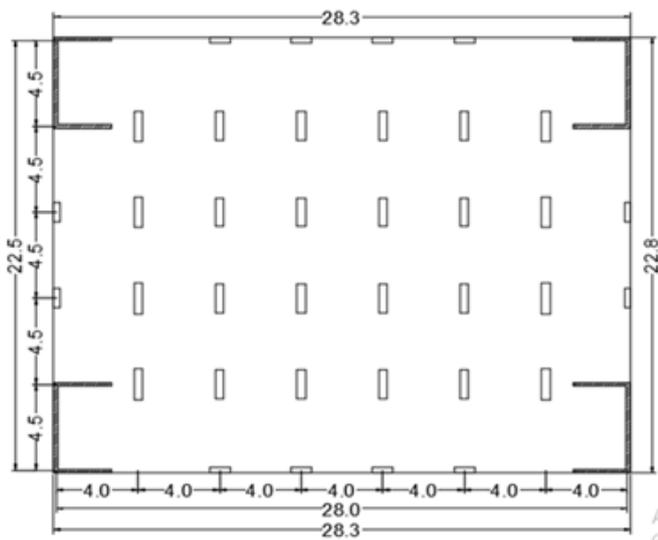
Model (8) Building with (U-Shape) Shear Walls at corners
